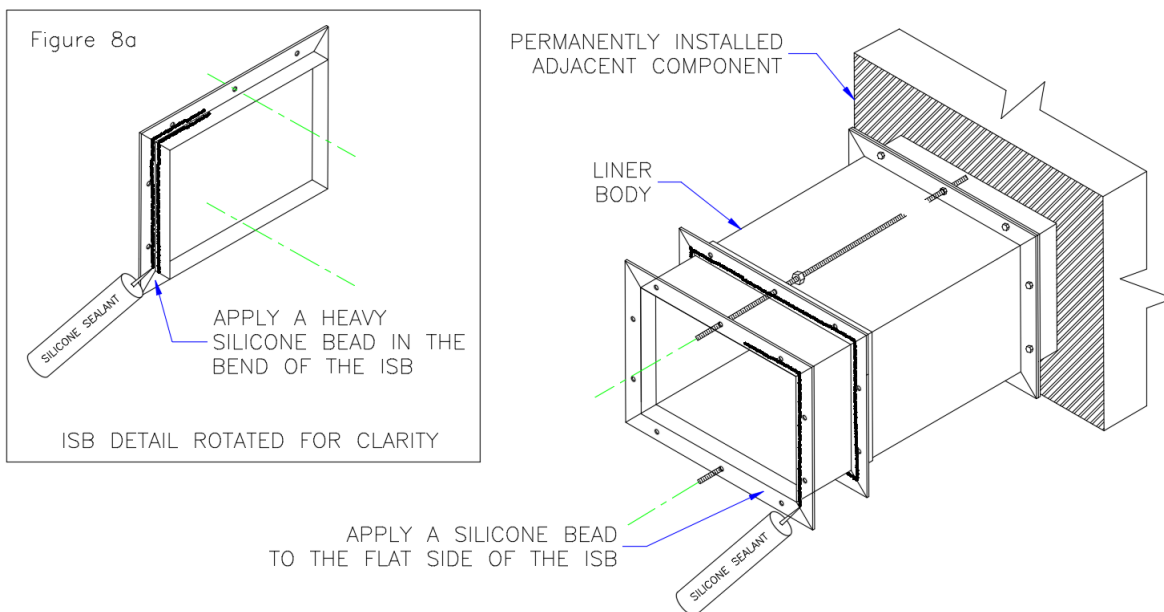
Insert the Internal Support Bracket into the cut end of the Liner Body and apply silicone to both.
